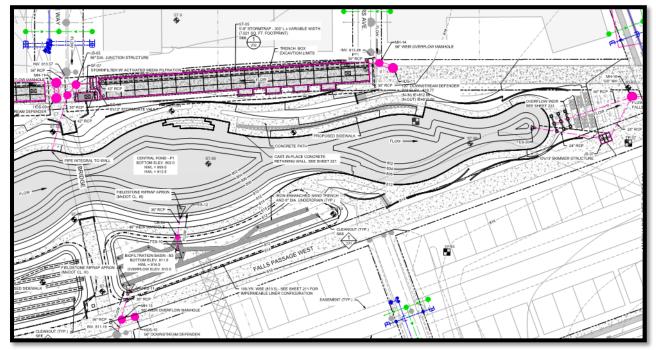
Preliminary Stormwater Layout for the Central Water Feature (South)
